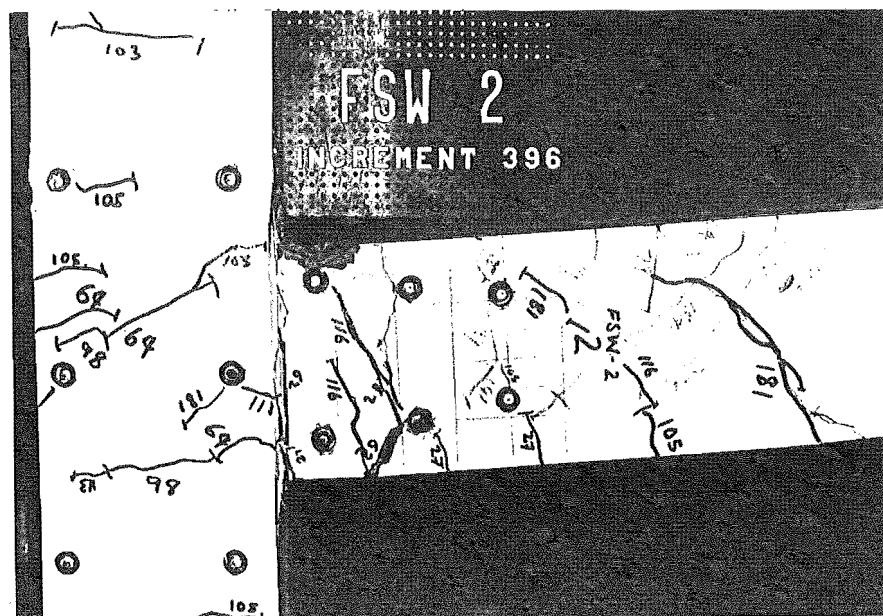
FSW-2 LEVEL 2 BEAM COLUMN JOINT, AT PEAK OF LR19 (NET TENSION ON COLUMN)
